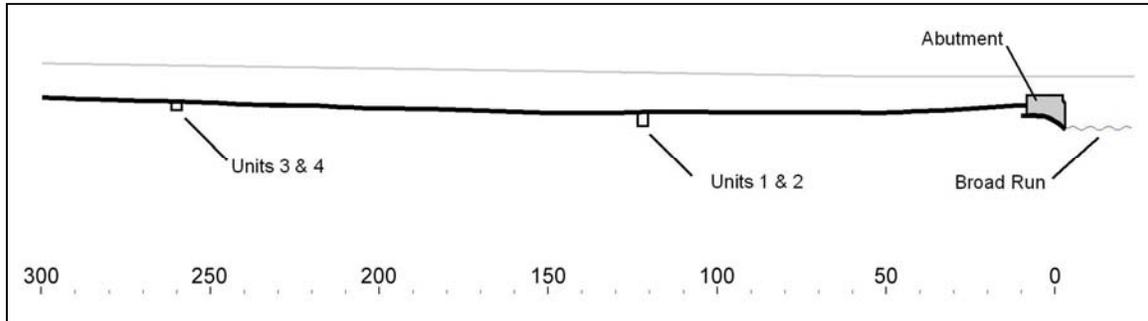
East-west profile of remnant Fauquier and Alexandria Turnpike corridor project area showing placement of archaeological units, stone bridge abutment, and Broad Run. Grade of Route 29 northbound lanes is light gray line.
